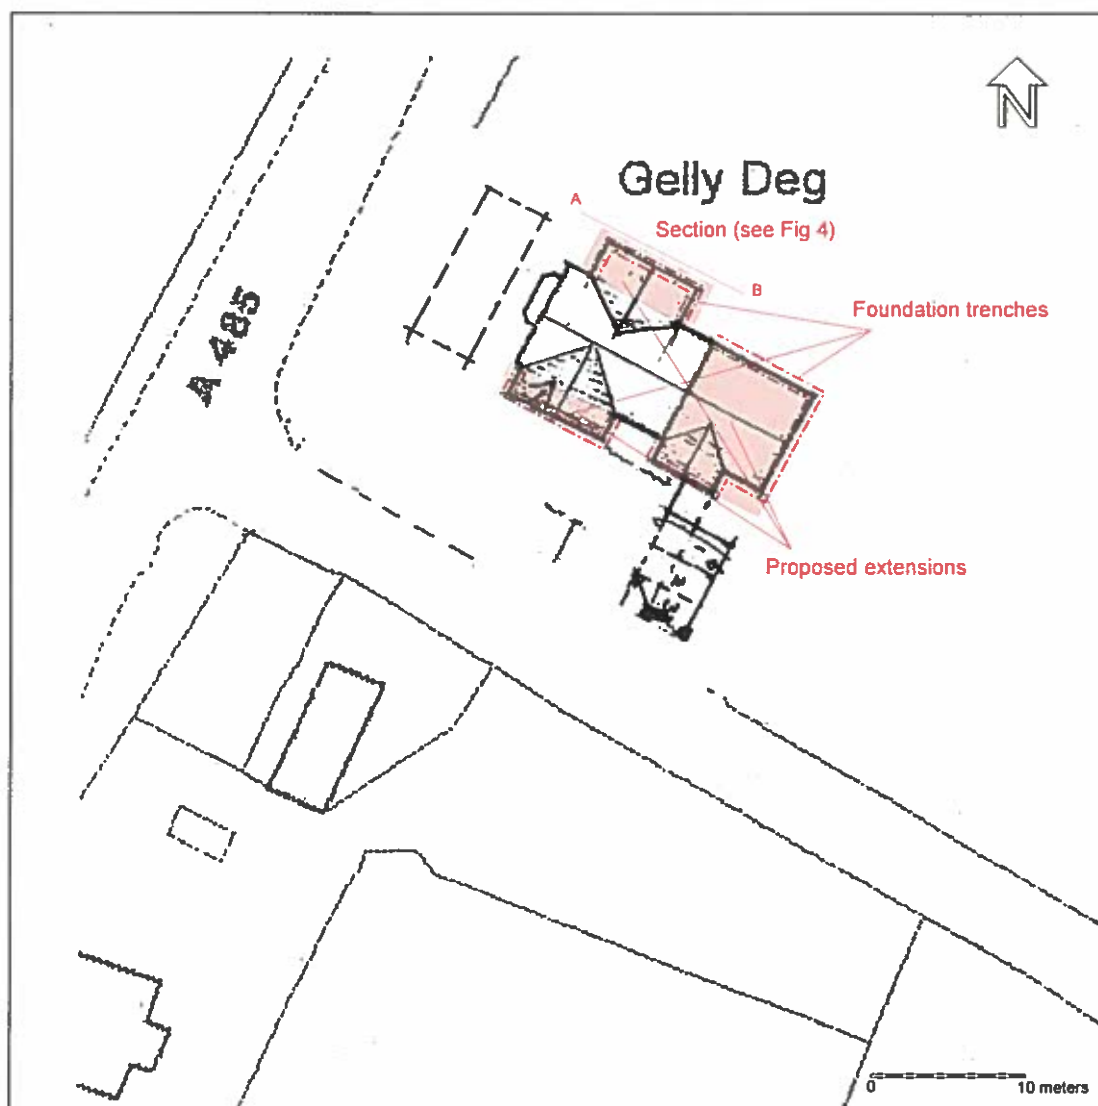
Proposal plan showing proposed extension with foundation trenches marked.
